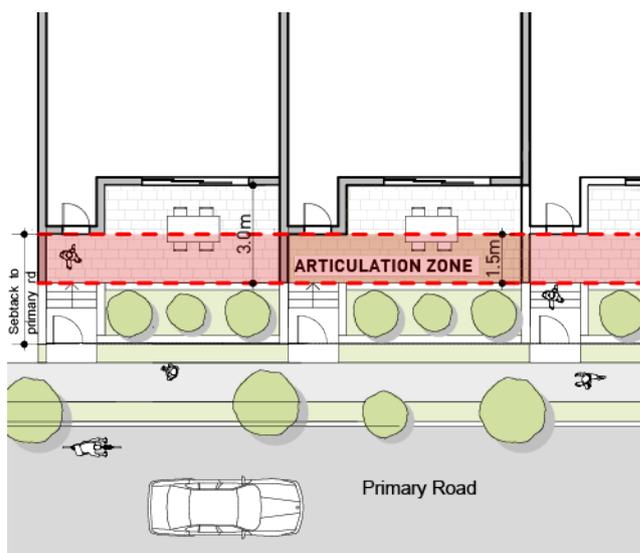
Private open space facing the street sits within the articulation zone or behind the front building line. It is separated from the street by landscaping and may include a low fences.
